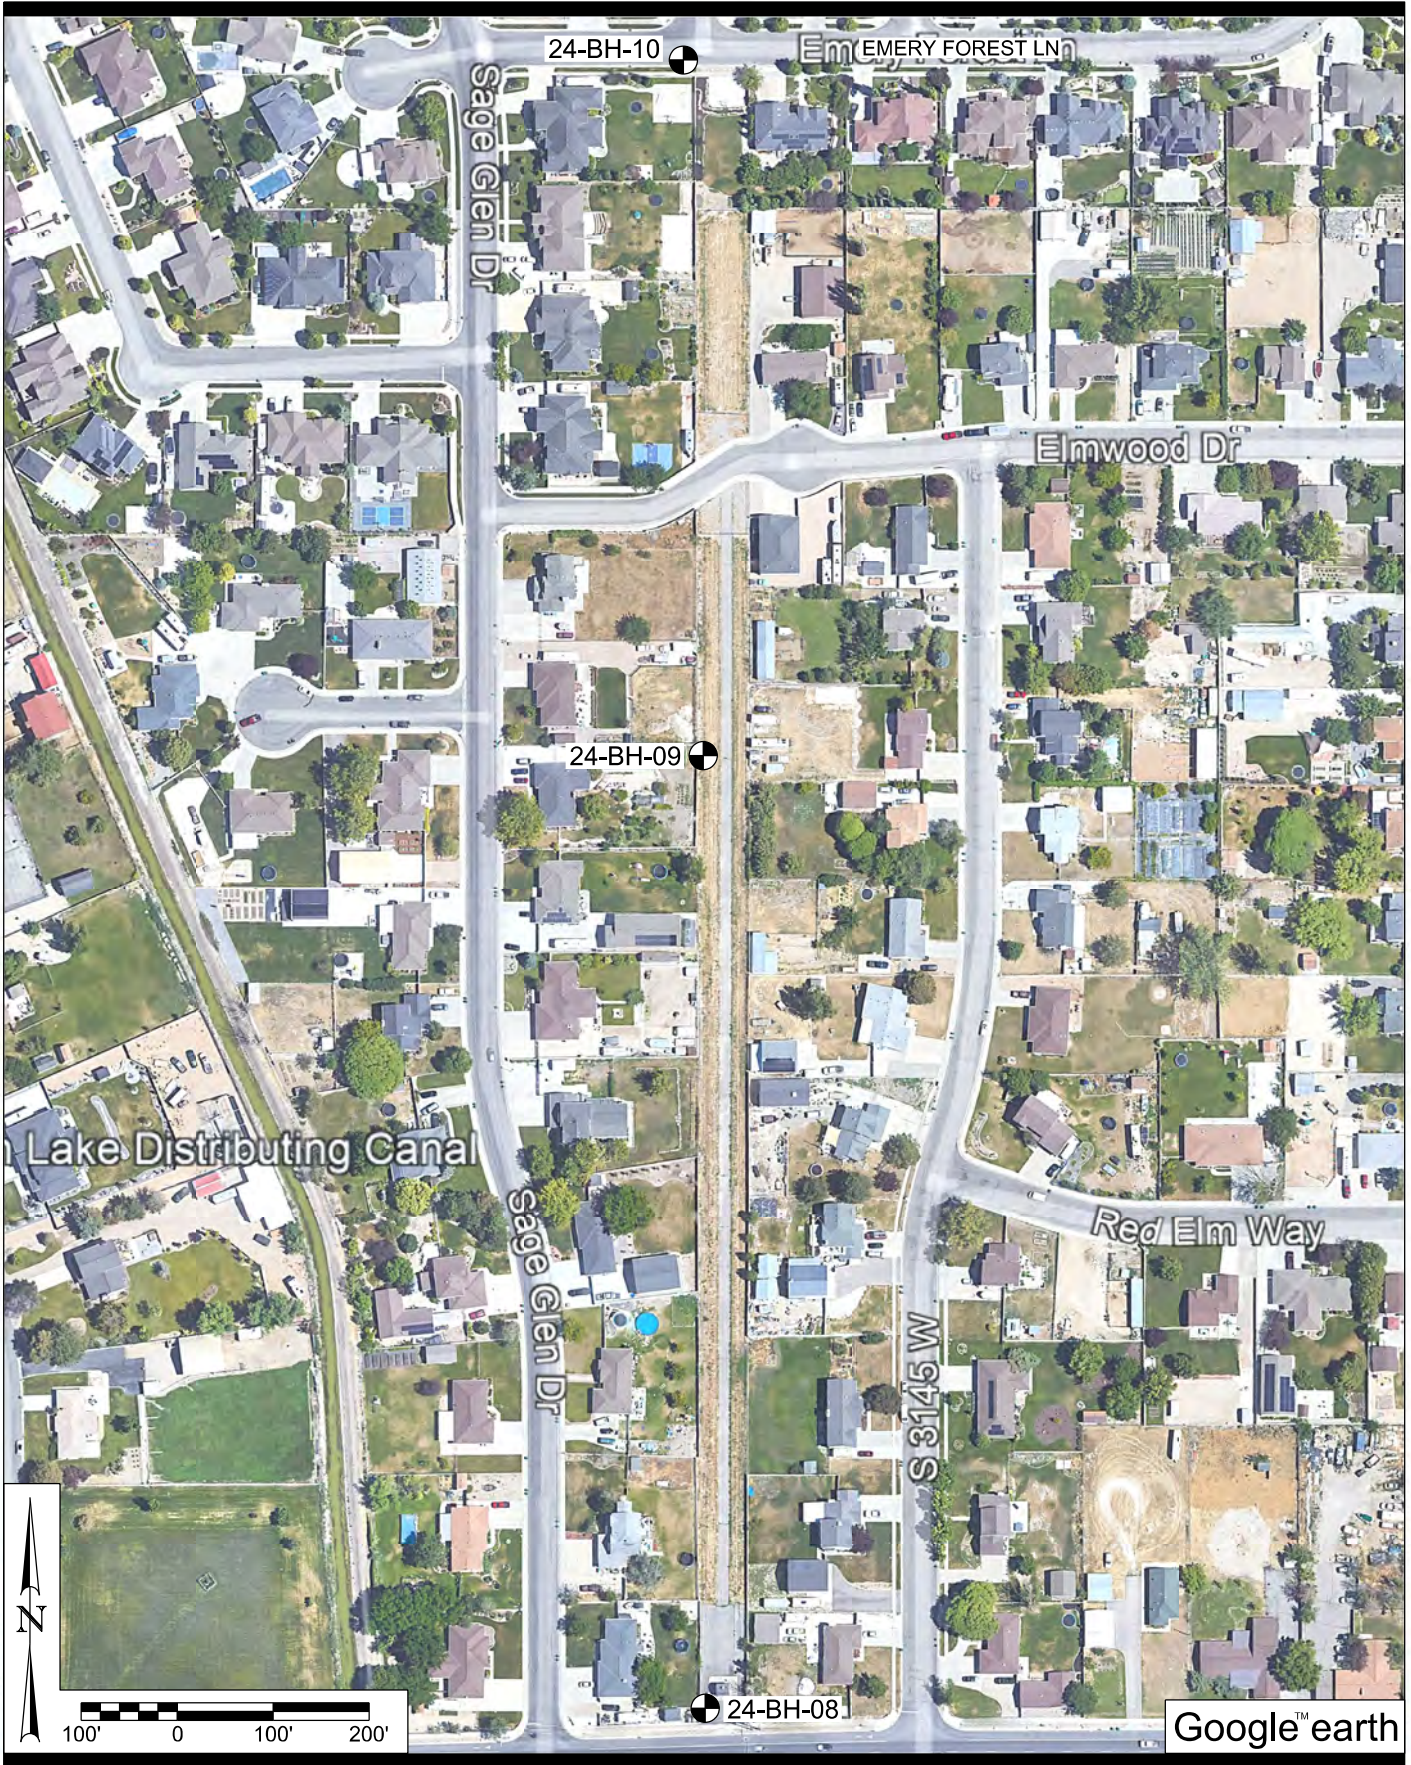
SITE PLAN & TEST HOLE LOCATIONS
